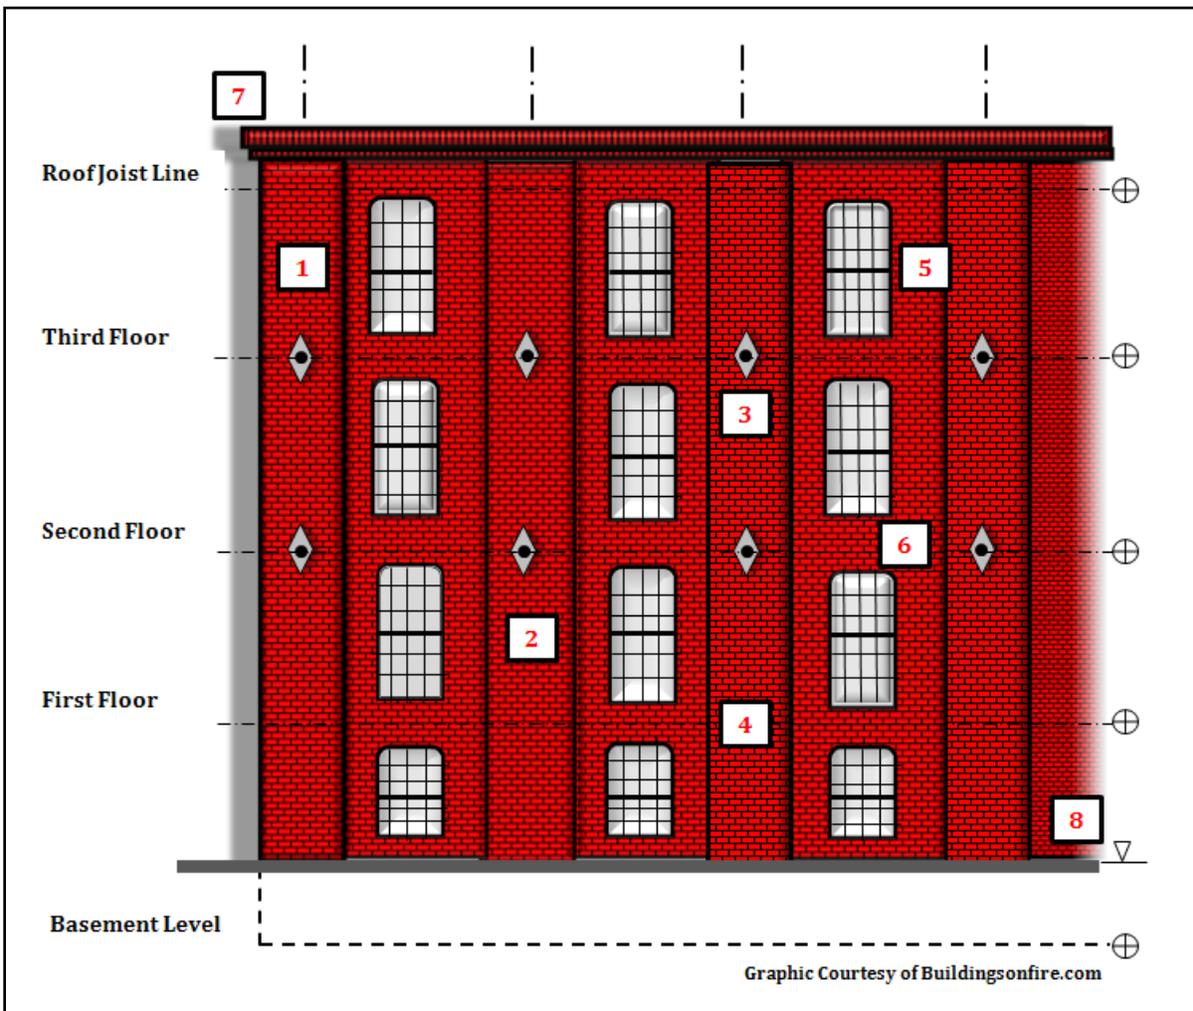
Masonry Brick Perimeter Wall Construction Floor Detail.
